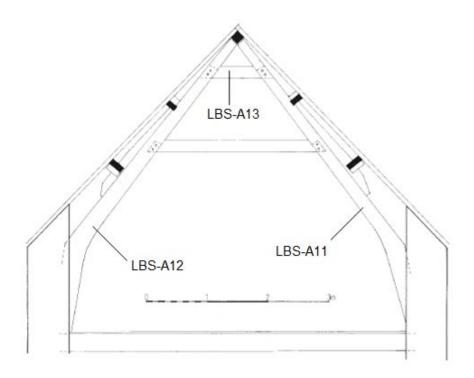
East range; truss 3 (east face), showing the location of samples LBS-A11-13 (Martin Roberts)
